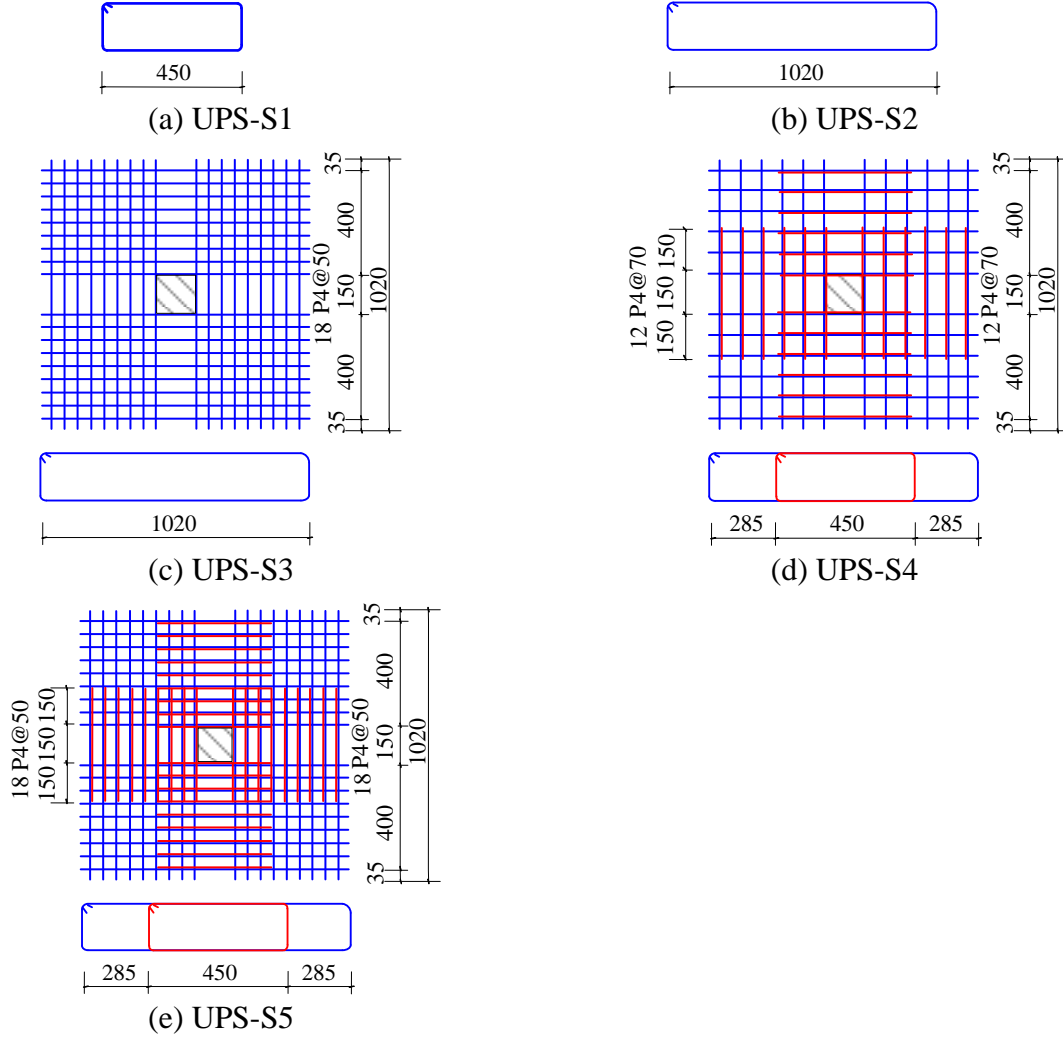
Stirrup layouts for UPS-SI (I=1 to 5) specimens (unit: mm)
